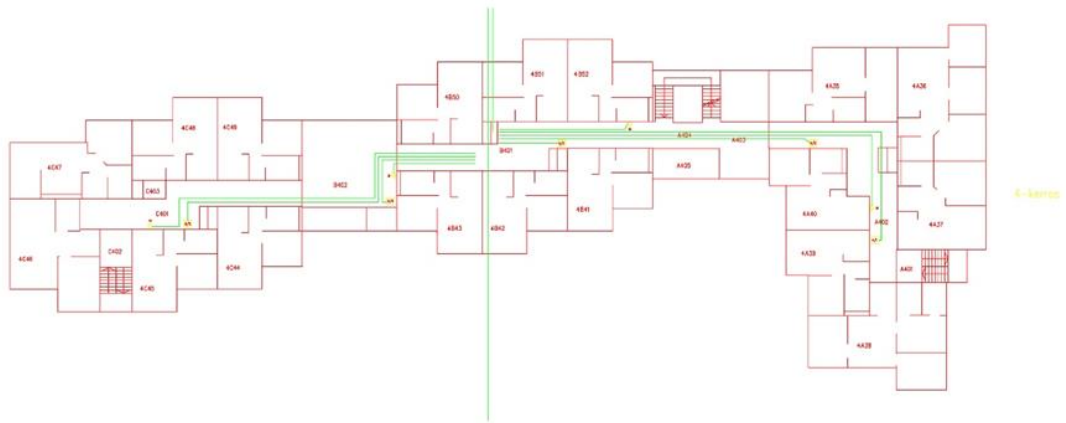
Floor plan of the 4th floor as a sample of the target building.
